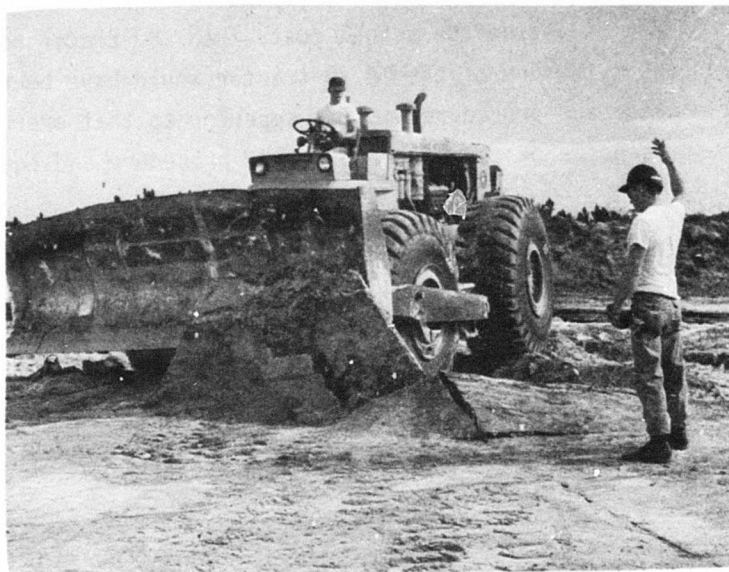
Test 1-3, 280 RT Lifting Upheaved Pavement from Inside the Repair
